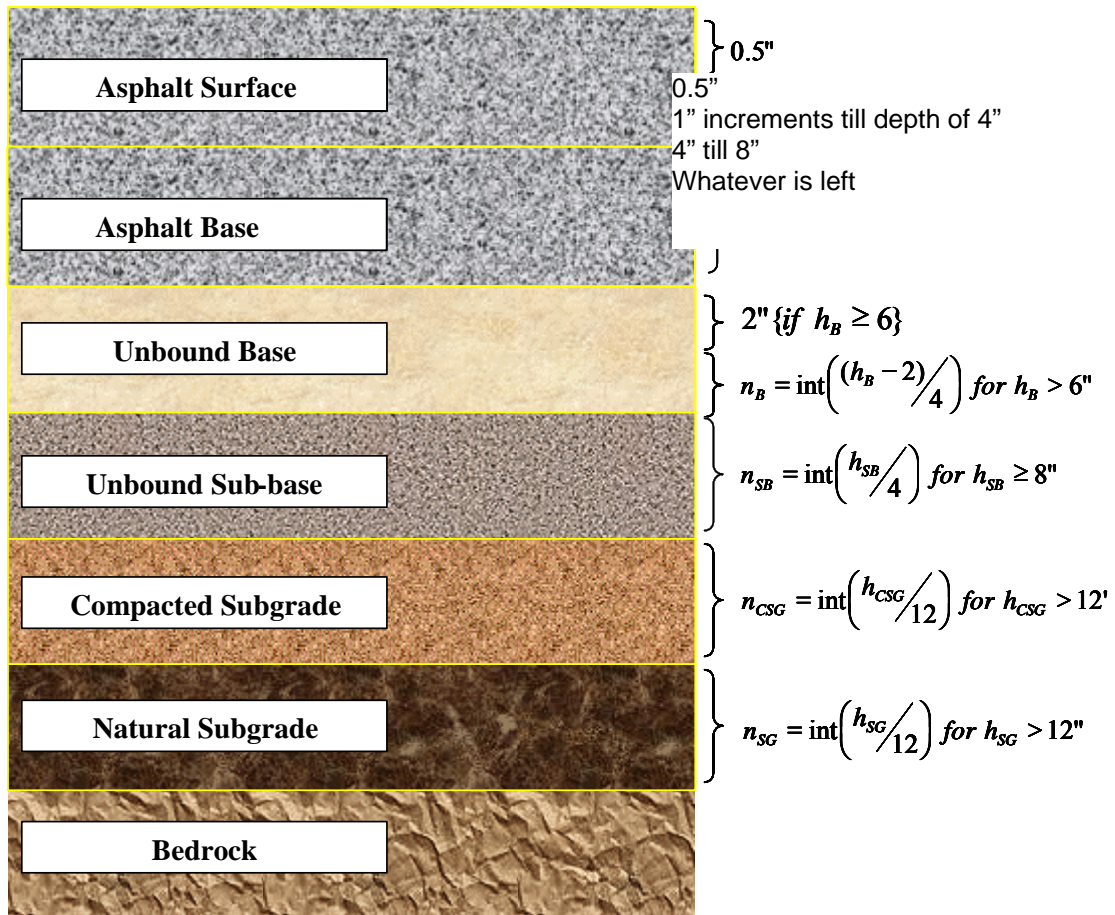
Layered Pavement Cross-Section for Flexible Pavement Systems (No Sub layering Beyond 8 Feet).
